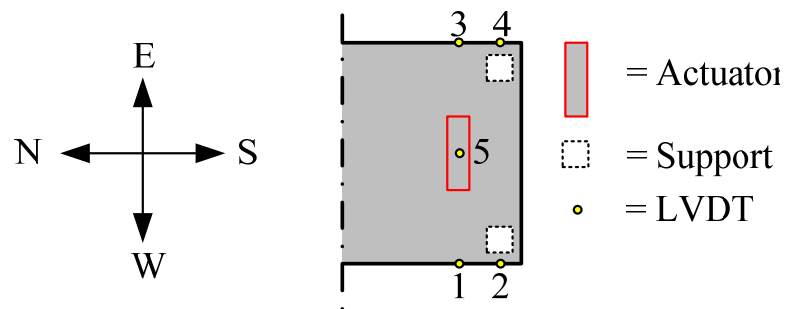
Schematic Plan of LVDT Under TPSBs at South End
